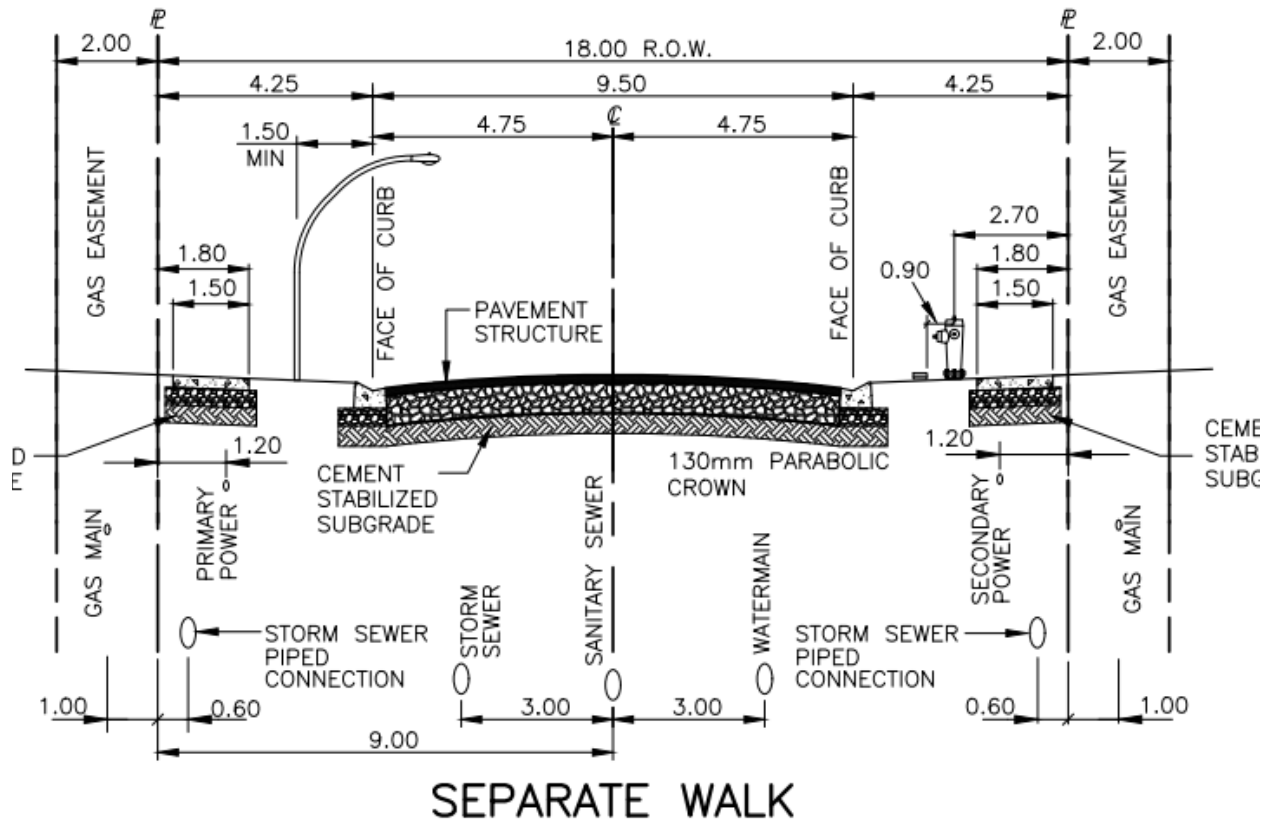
Separate-walk local road cross section, Spruce Grove Engineering Standards
